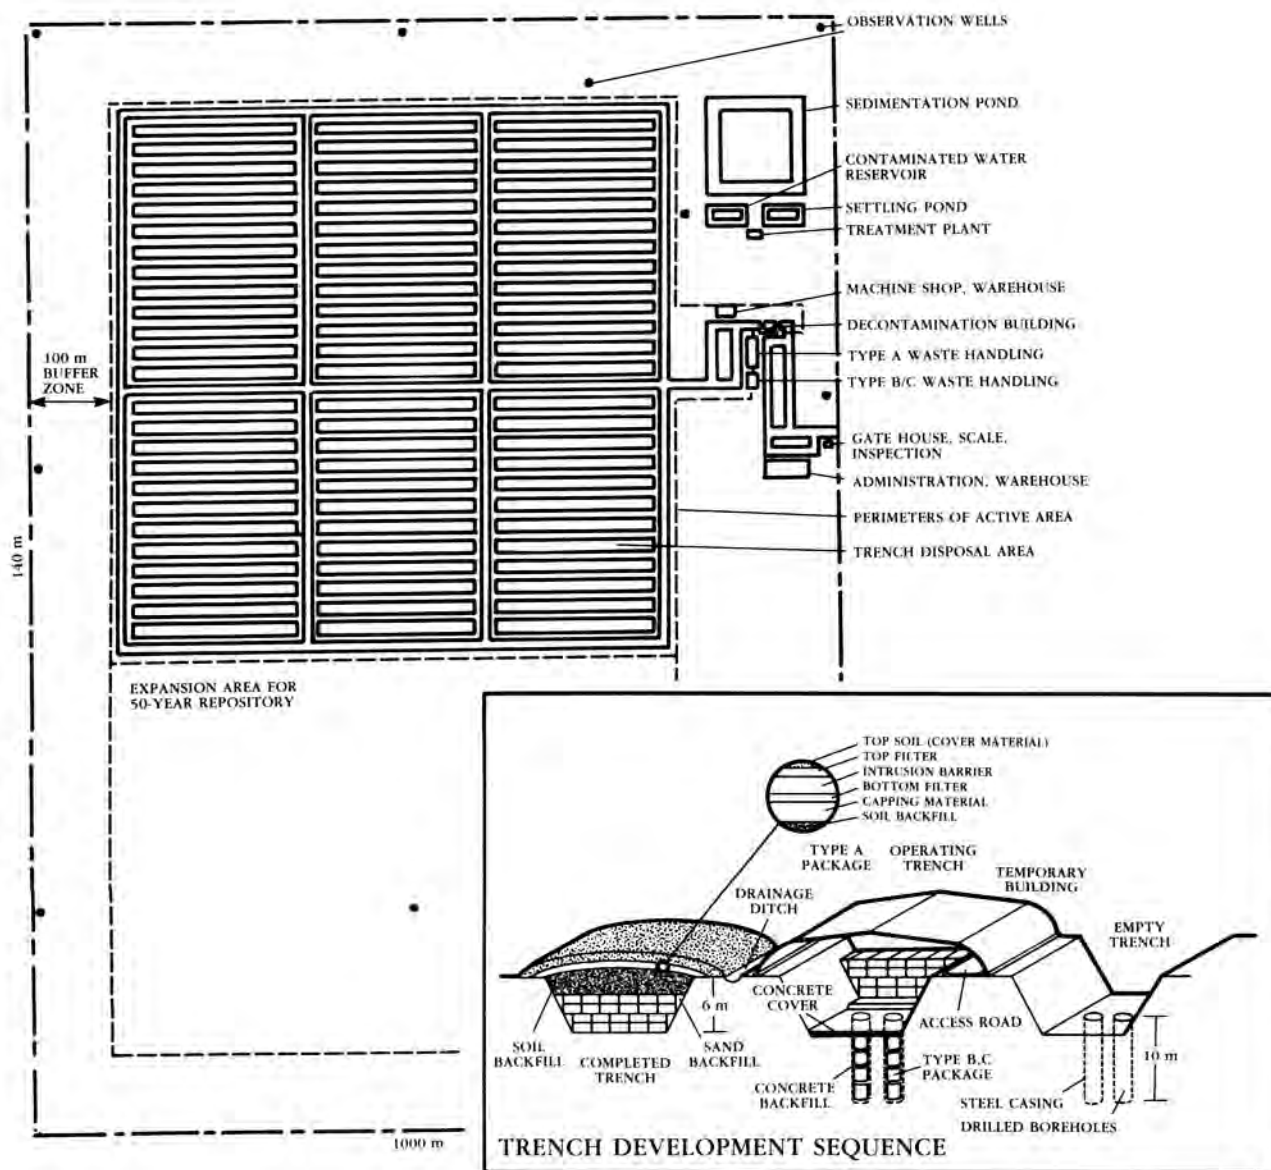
Plan and Design Detail of the Trenches for the Shallow Land Burial Concept.
